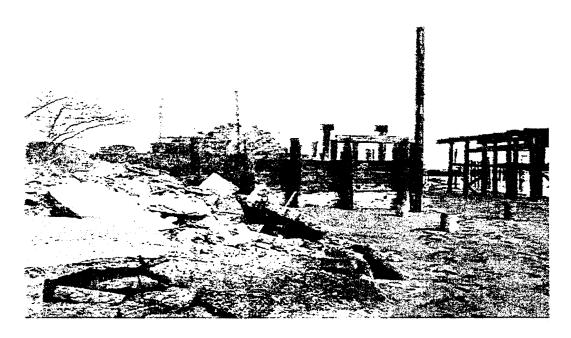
Southern end of Site, Concrete Rubble and Bulkhead
